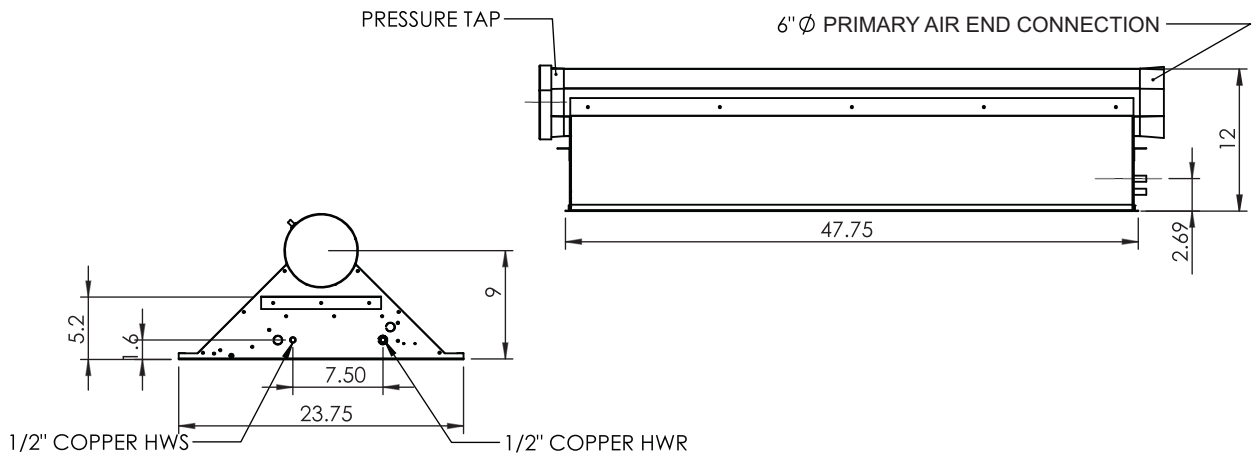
36CBAL, 4-Pipe, Size 06 Unit Dimensions
